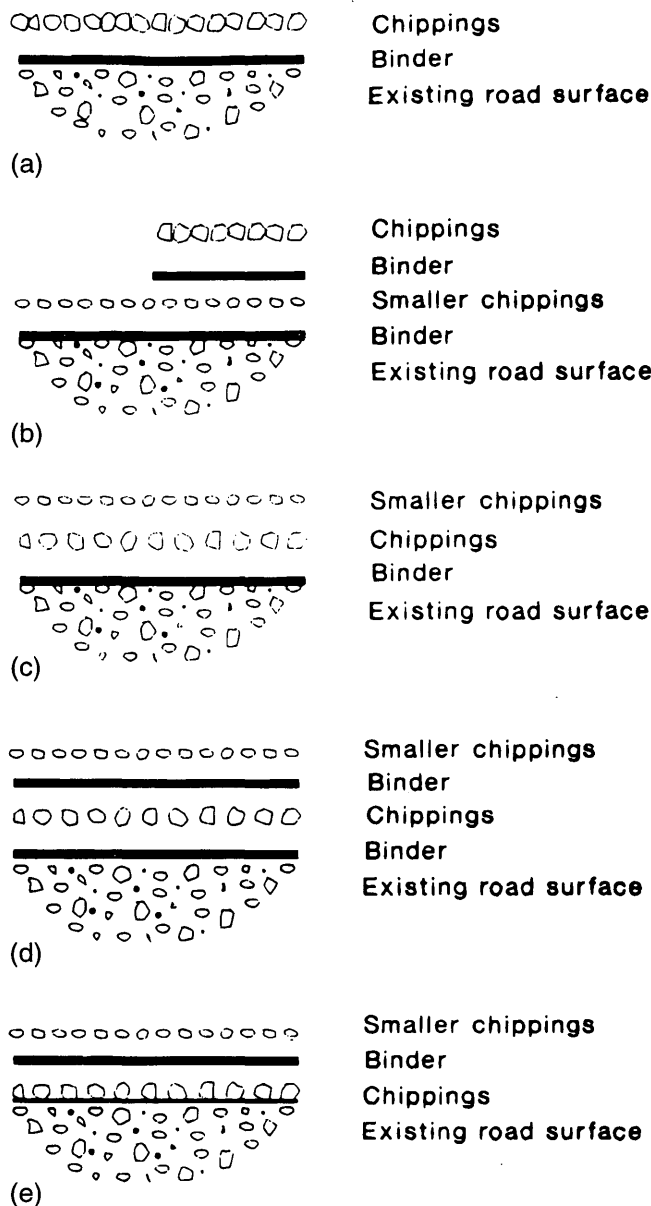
Types of surface dressing: (a) single dressing, (b) pad coat plus single dressing, (c) racked-in dressing, (d) double dressing, (e) sandwich dressing.
